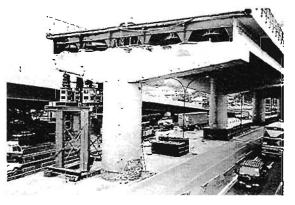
Hanshin Expressway, Kobe Route 3, Fukae-Honcho Section close-up of pier in foreground of Plate 6.22 showing small lateral bars and curtailed longitudinal bars.
